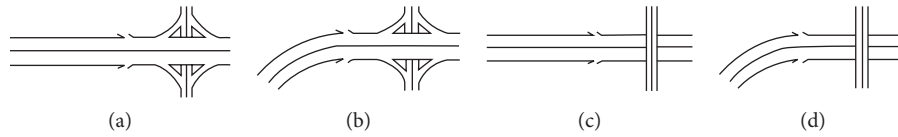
The sketches of connection and linear section. (a) The sketch of the connecting overpass and straight linear section. (b) The sketch of connecting overpass and bend linear section. (c) The sketch of connecting straight linear section. (d) The sketch of connecting bend linear section.
